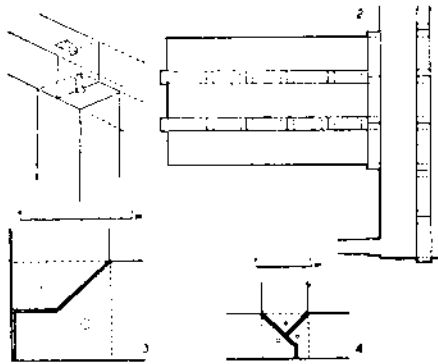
Methods of setting architraves: on a pillar (1), in two aisles of a T-shaped hall (2, valley-temple of Chephren), at right angle on a pillar (3), three architraves meeting on a pillar (4).
